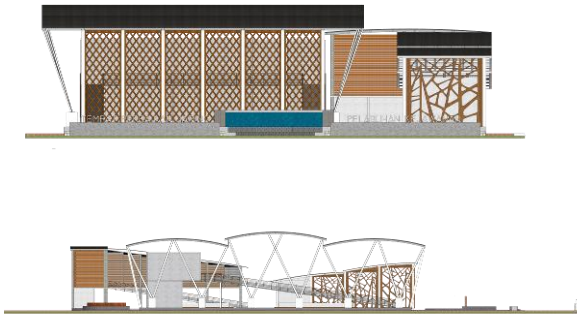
The concept of building shape and wide-span structure for the fishnets repairing workshop
